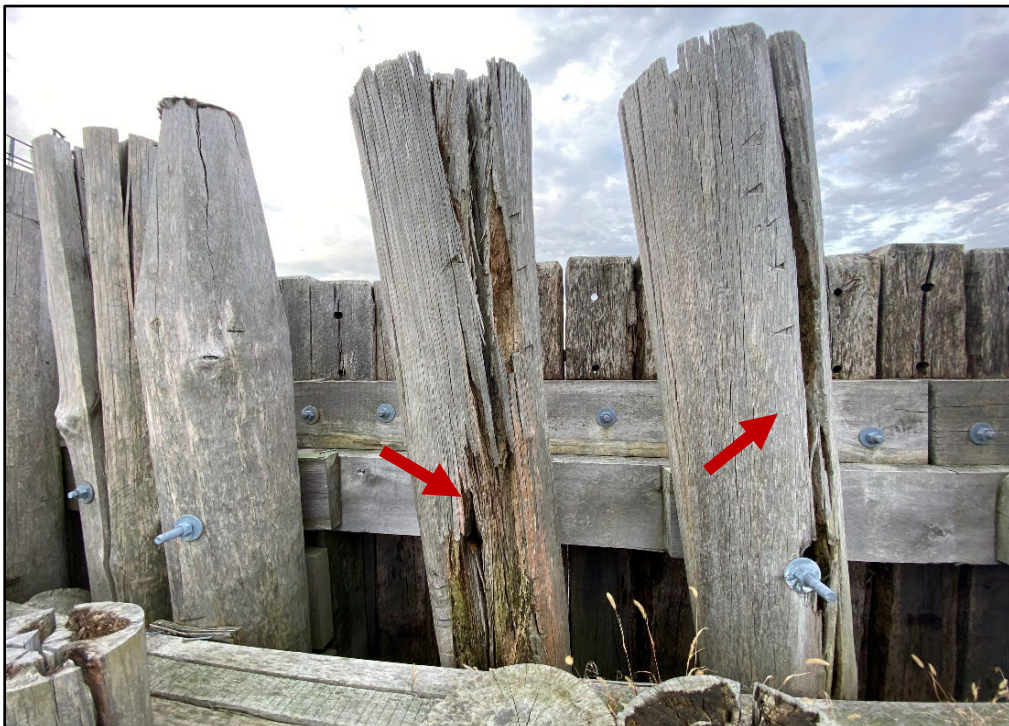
Tops of the timber piles making up the north timber fender rack at Hart Island with splitting and hollowing due to rotting, looking south.
